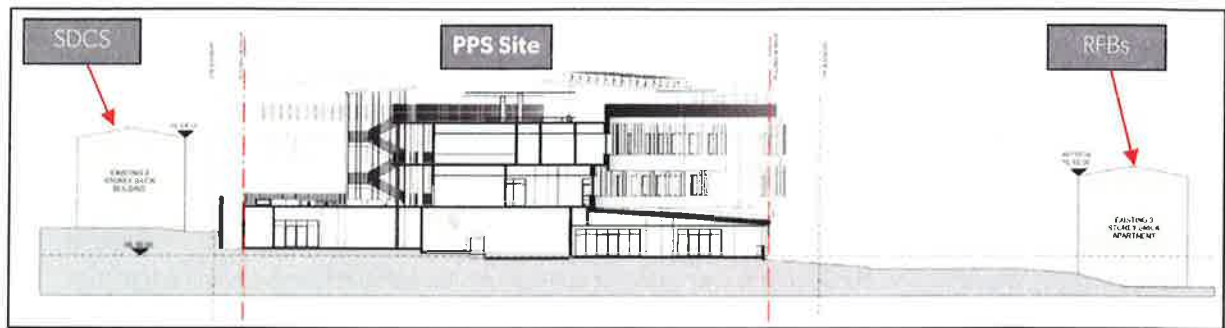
| Southwest to northeast site cross section (Source: Applicant's EIS 2018).
